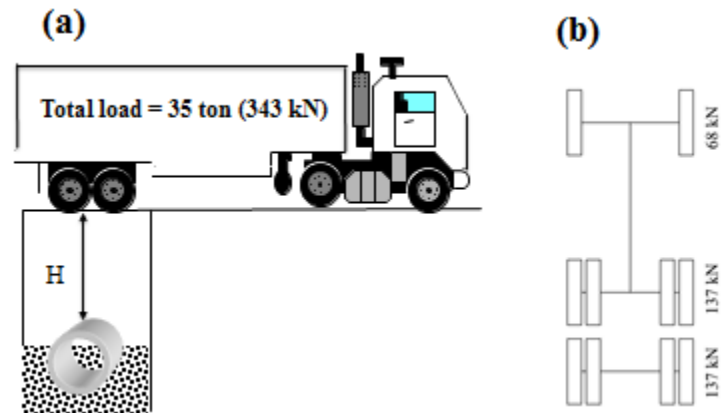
a) Schematic of pipe under truck loading b) tire/load configuration of the loading truck
